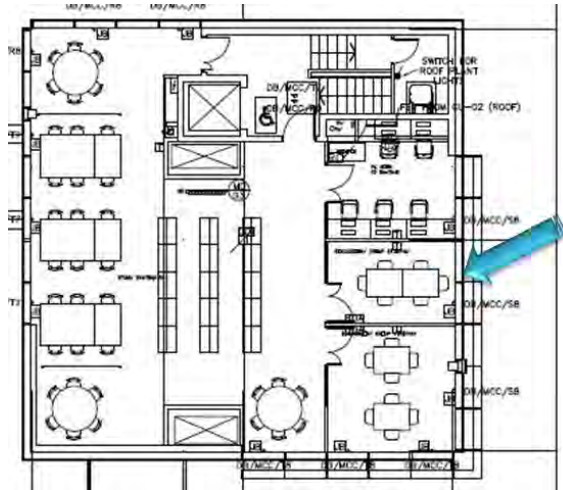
First floor plan of the demonstration building with a modelled room showed
